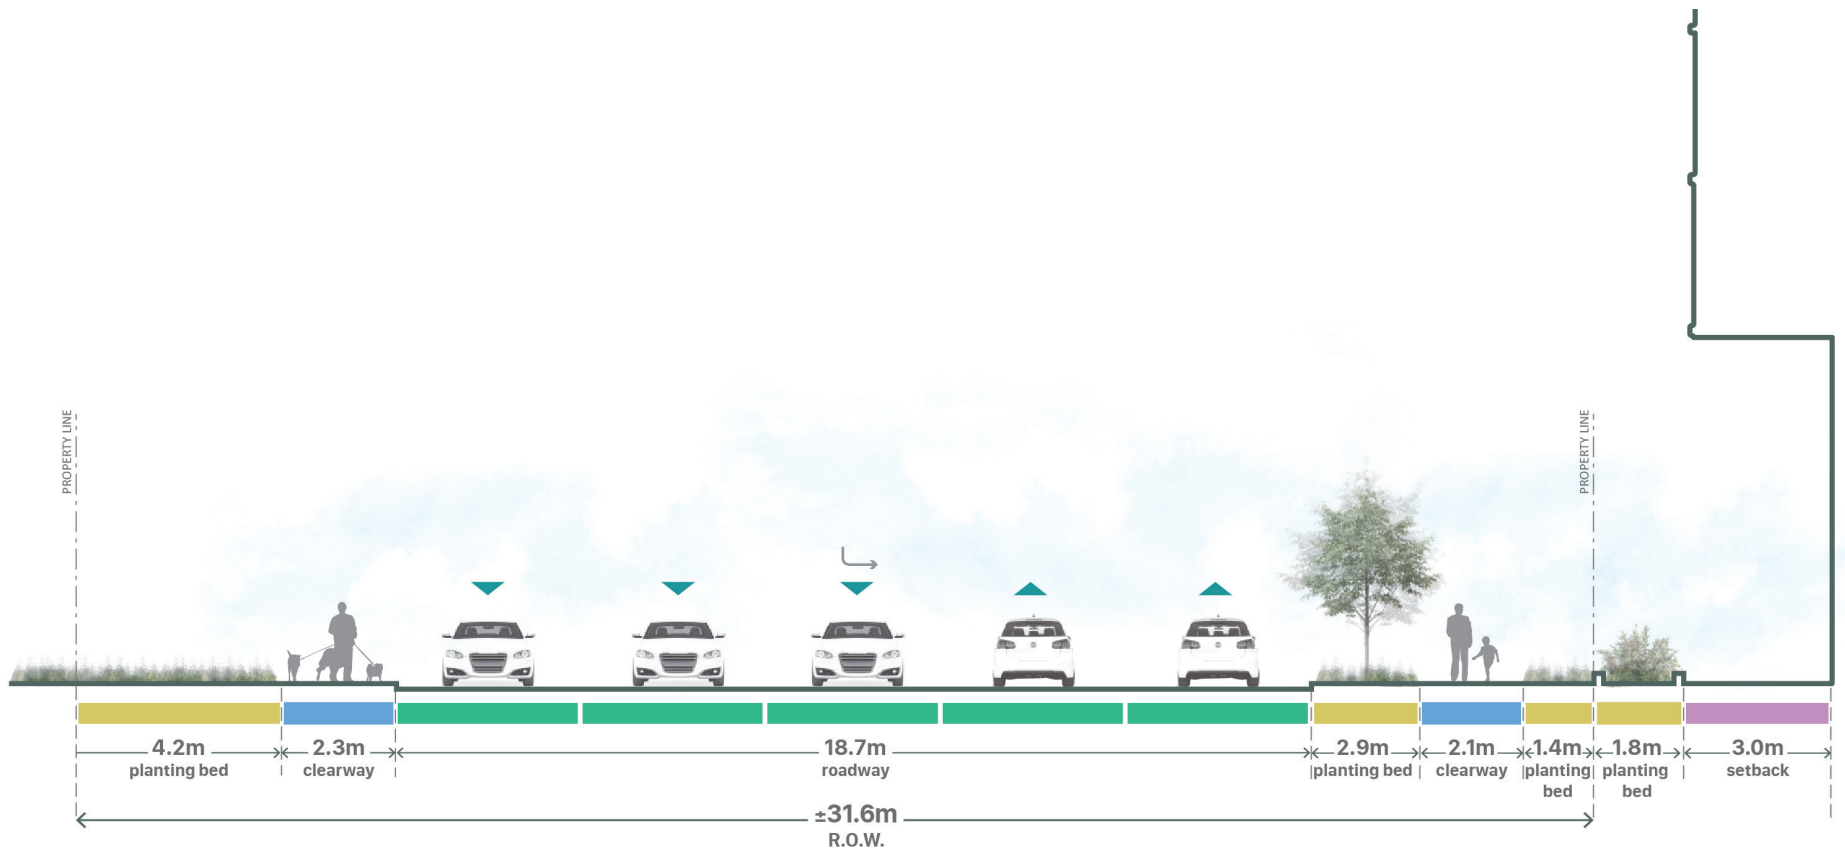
Section CC - Lawrence Avenue East - Proposed Condition
